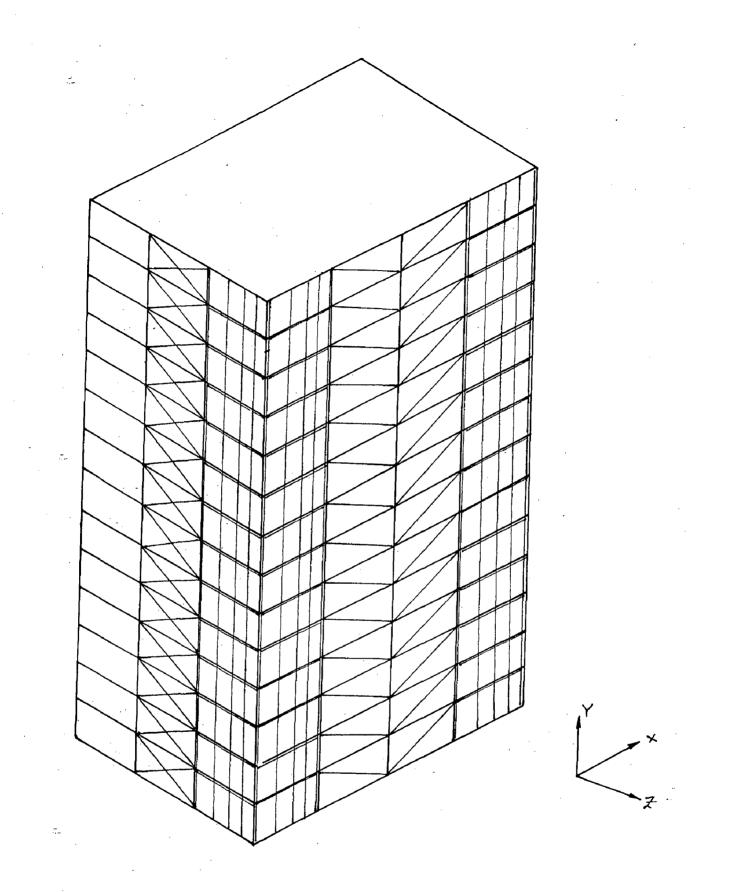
Frame in z-direction with cross brace and infill masonry wall
